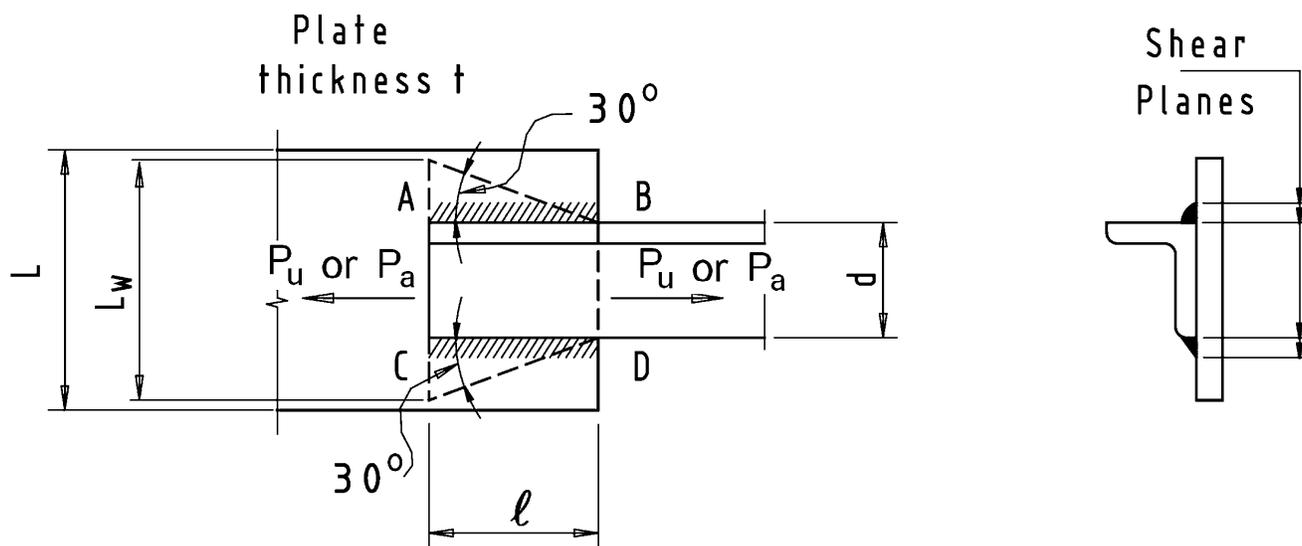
Whitmore section yielding of an angle welded to a plate or tee stem.
